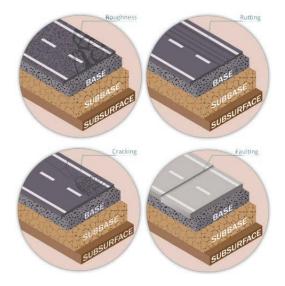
Pavement Condition Thresholds and Condition States for Federal Pavement Condition Metrics
